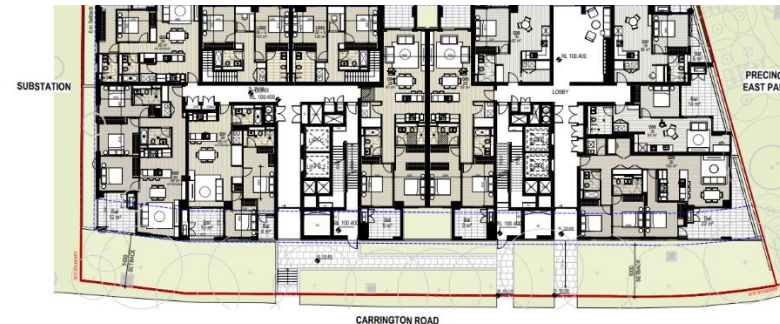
Ground floor plan showing building entries from Carrington Road (Source: Group GSA)
